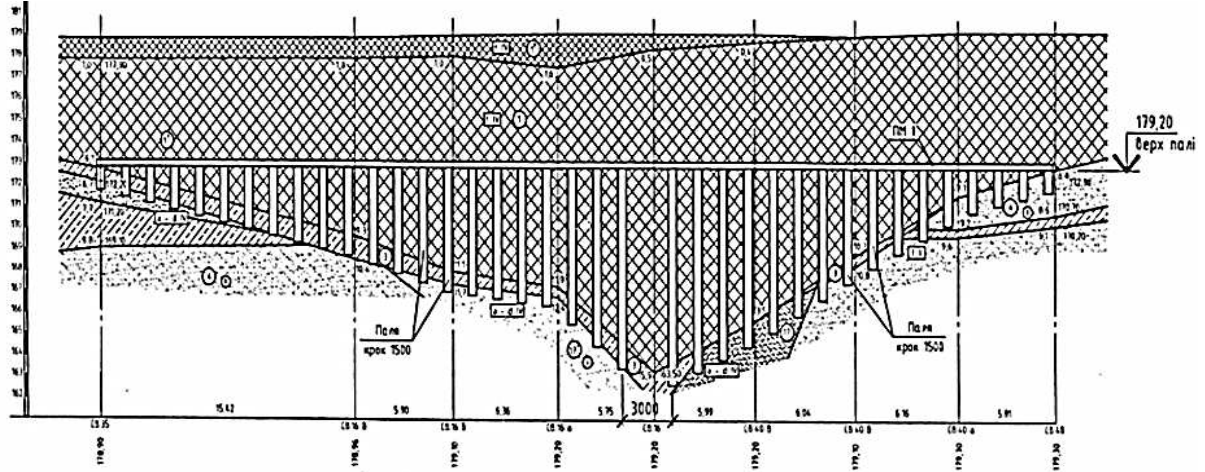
Diagram fixing under slab foundation soil-cement elements
